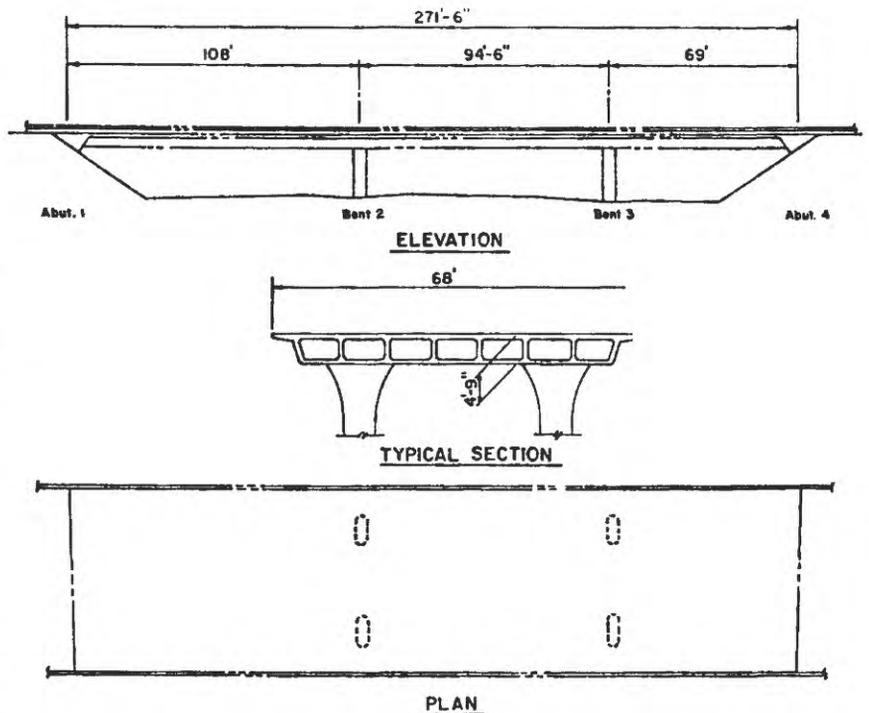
Plan, elevation, and typical section of Route 289-680/101 Separation.
